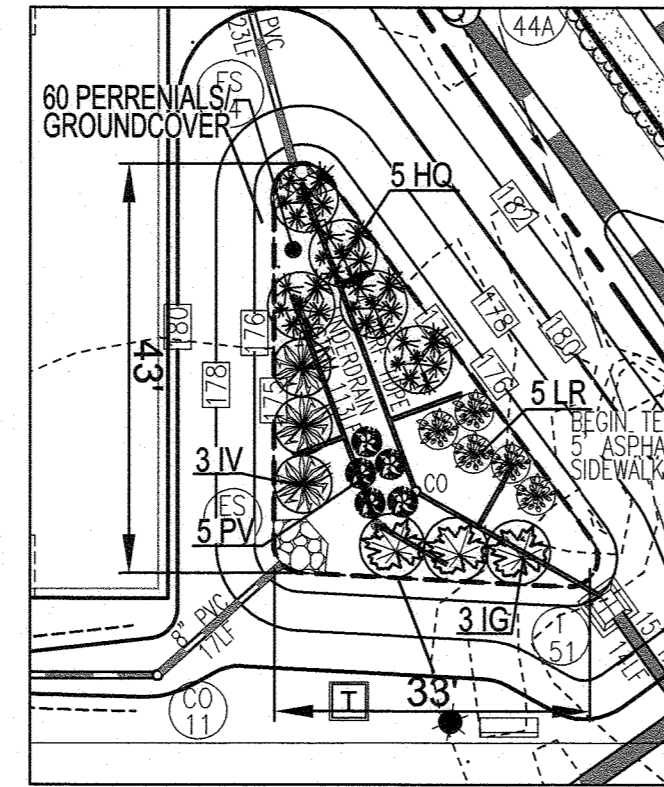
DETAILED BIO AND PLANTING PLAN (SWM #18 & 19)
